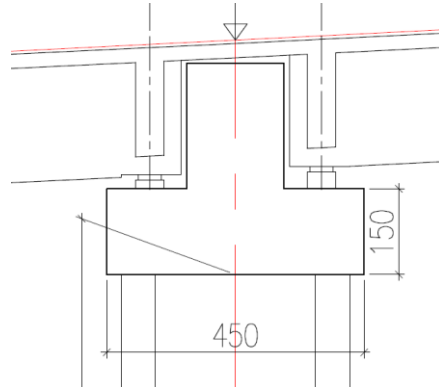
Profile view of pier axis P1 to show the pier cap details
